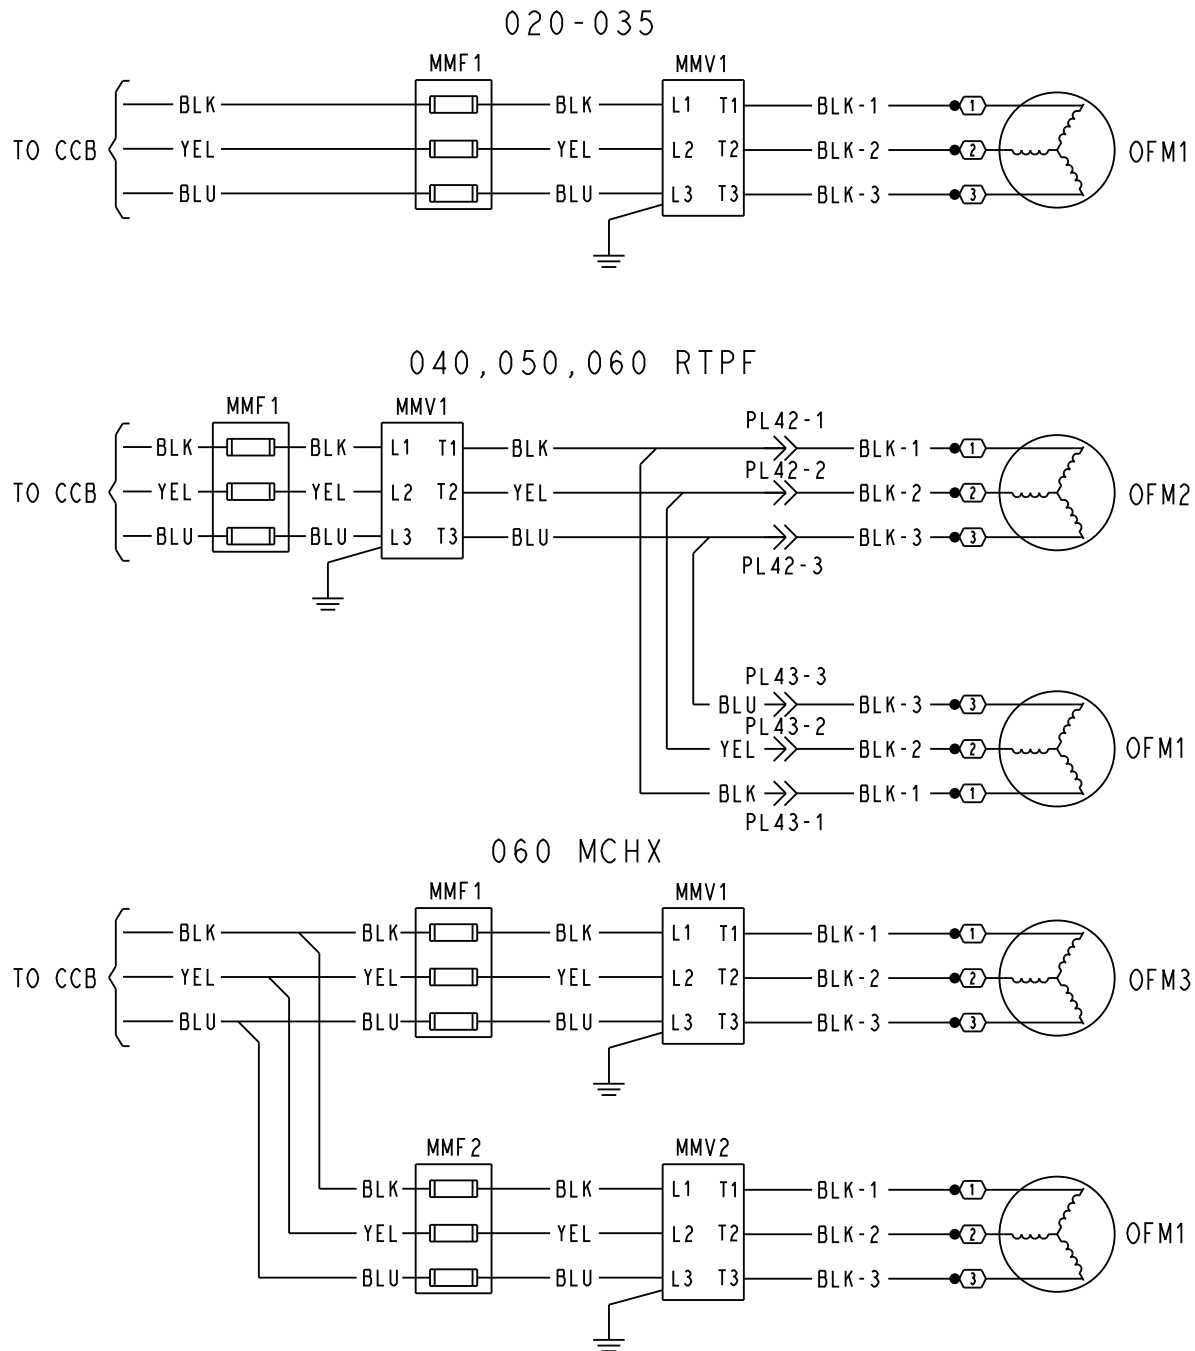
Fig. Q — Low Ambient Motormaster V Wiring (48/50A020-060 Units Shown)
